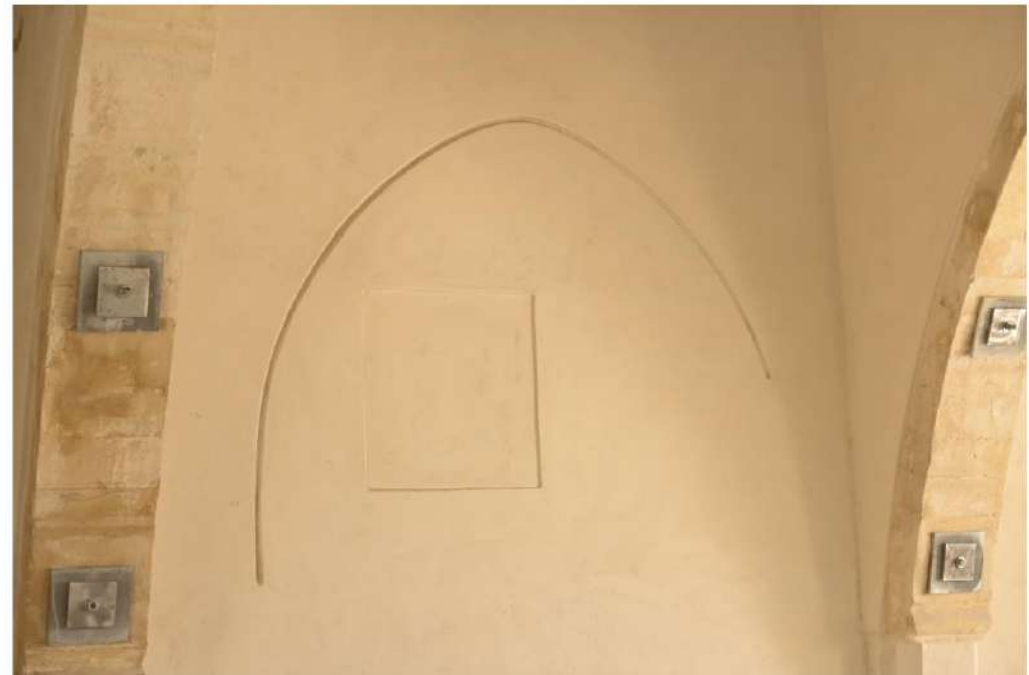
Founding of larger window that will be strengthened with two (2) timber ties.
